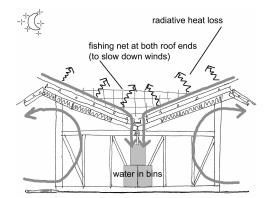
Cross and stack night ventilation in the V-shaped roof configuration.
